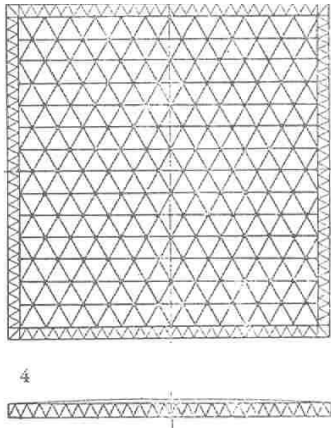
Roof plan of the swimming pool in Boulogne-Billancourt, Ref 1
